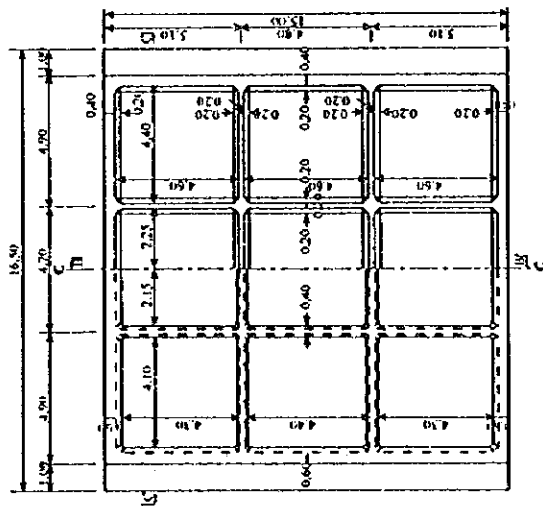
Typical Cross Section of Breakwater - Latakia Port
